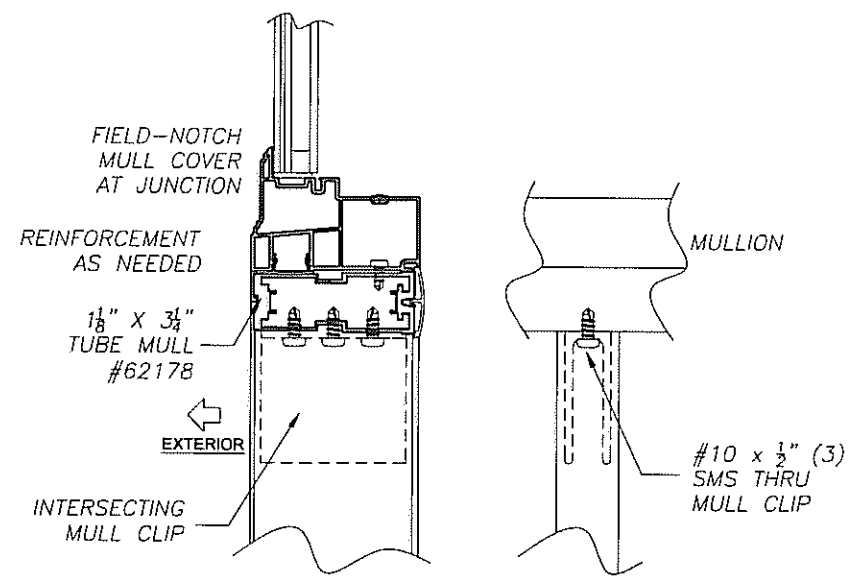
MULLION CLIP TO 1X WOOD BUCK
